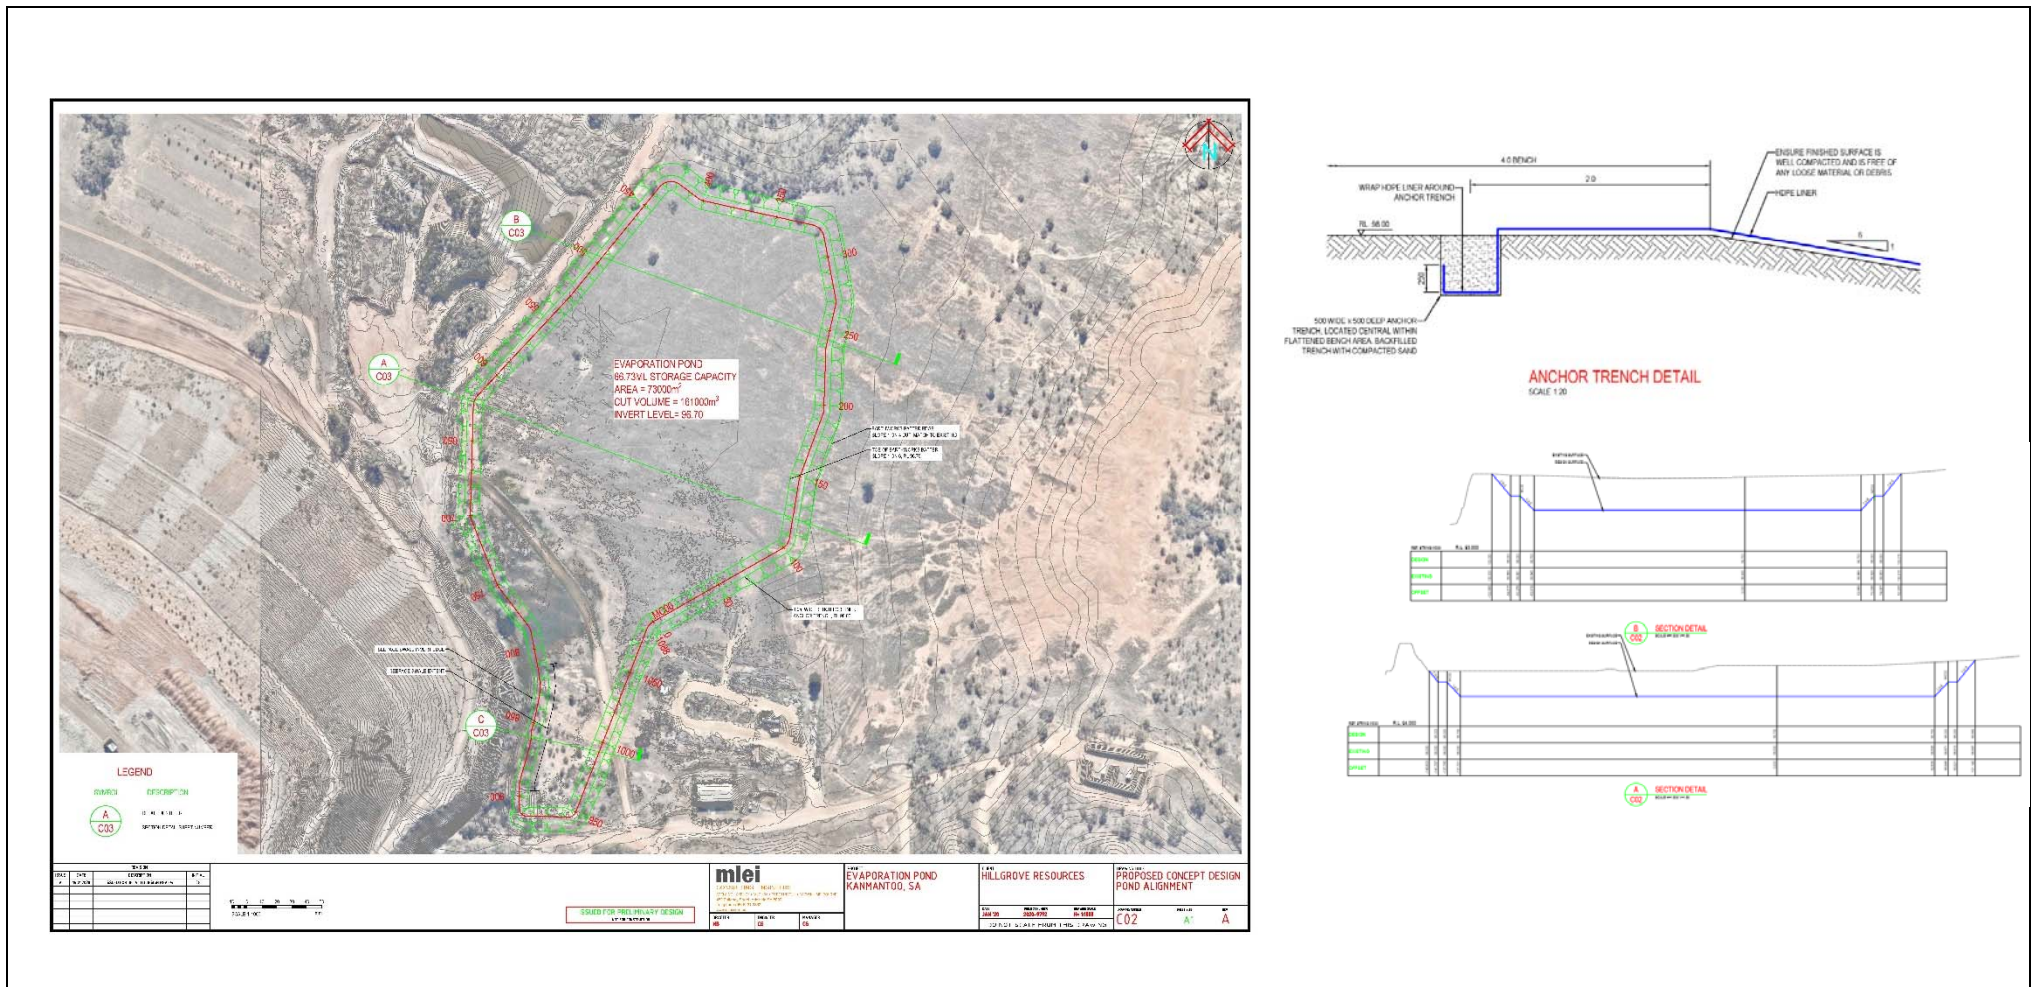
Design details for proposed northeastern sediment / evaporation pond
